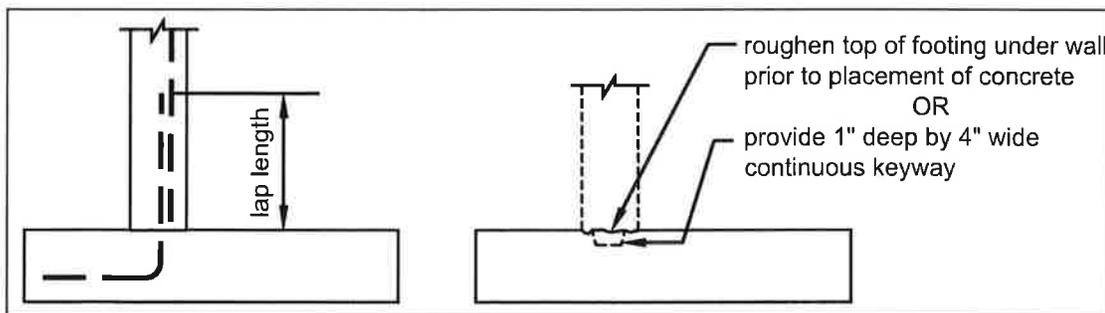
VERTICAL REINFORCEMENT TIE HOLD DETAIL
